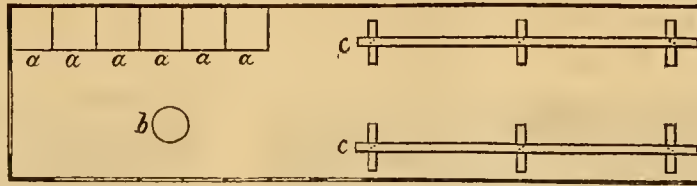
PLAN OF INTERIOR OF HOUSE.
